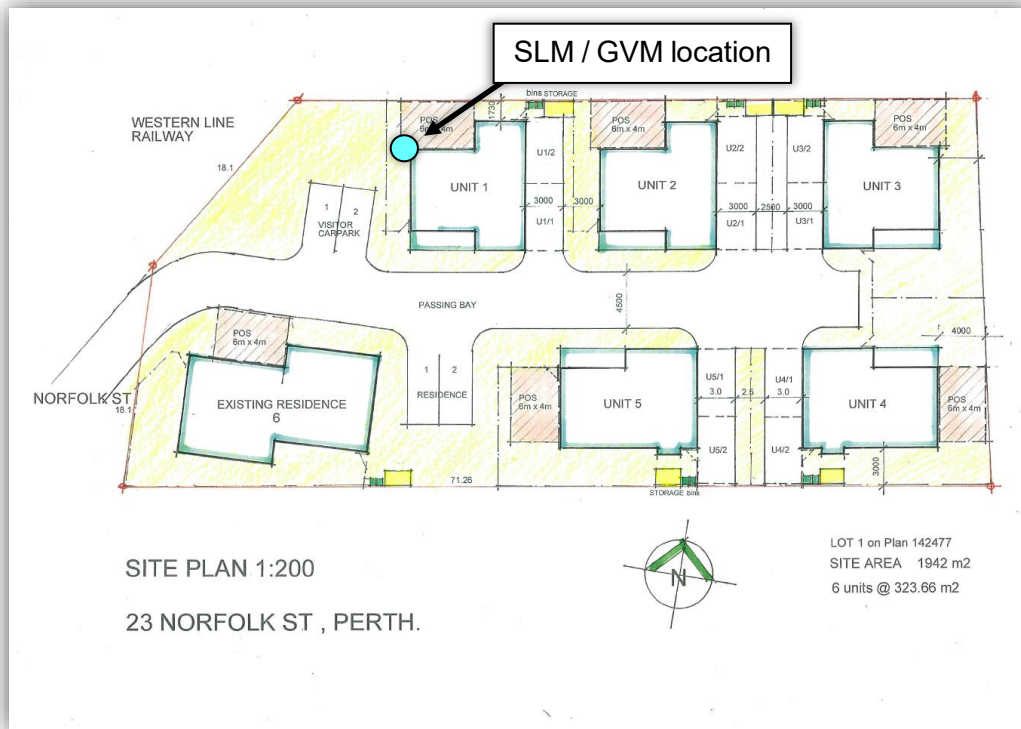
Site plan of 23 Norfolk St, provided by Abode Designer Homes.
